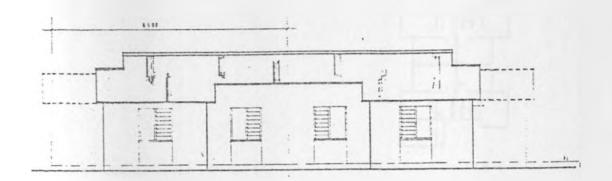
T2 Section and Foundation Plan source; NHC, 1994
